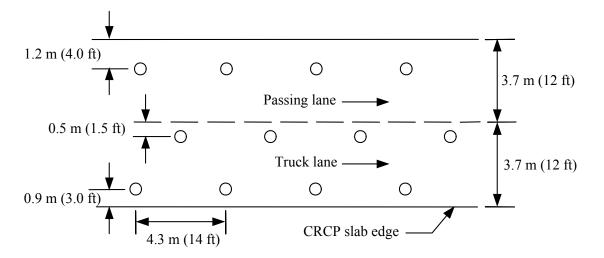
Hole pattern used on a continuously reinforced concrete pavement (Barnett, Darter, and Laybourne 1980).
